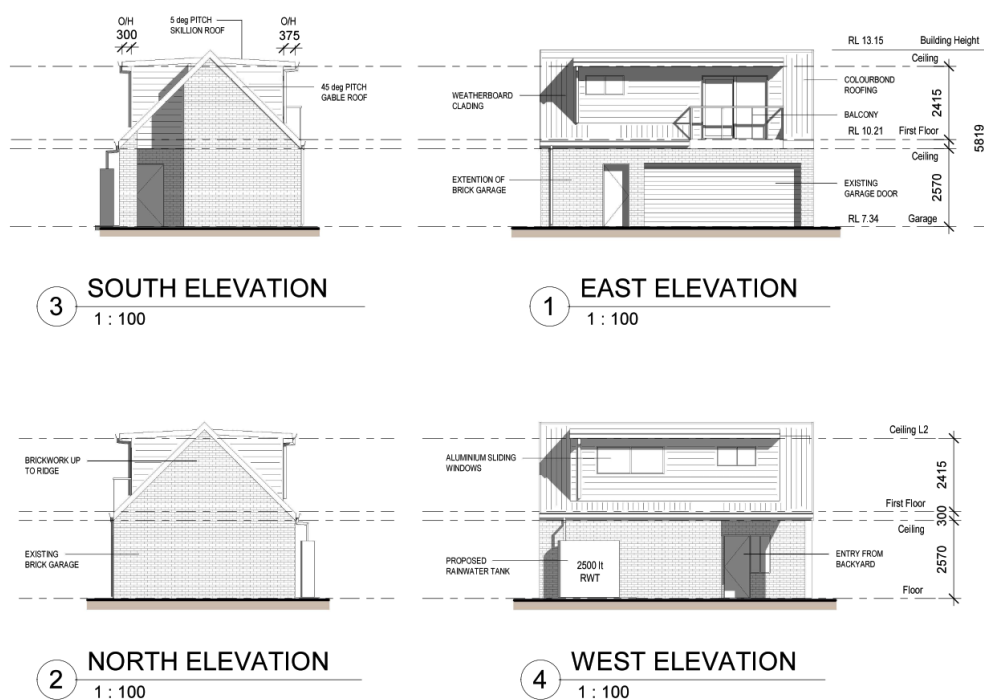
Proposed rear garage and first floor secondary dwelling elevations at 5 Alfred Street, Mascot
